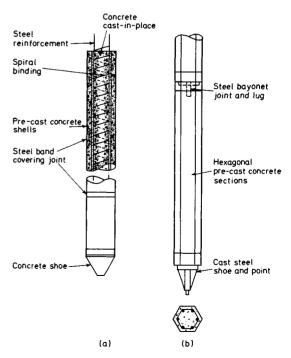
Jointed precast concrete piles. (a) West's shell pile; (b) Herkules pile
